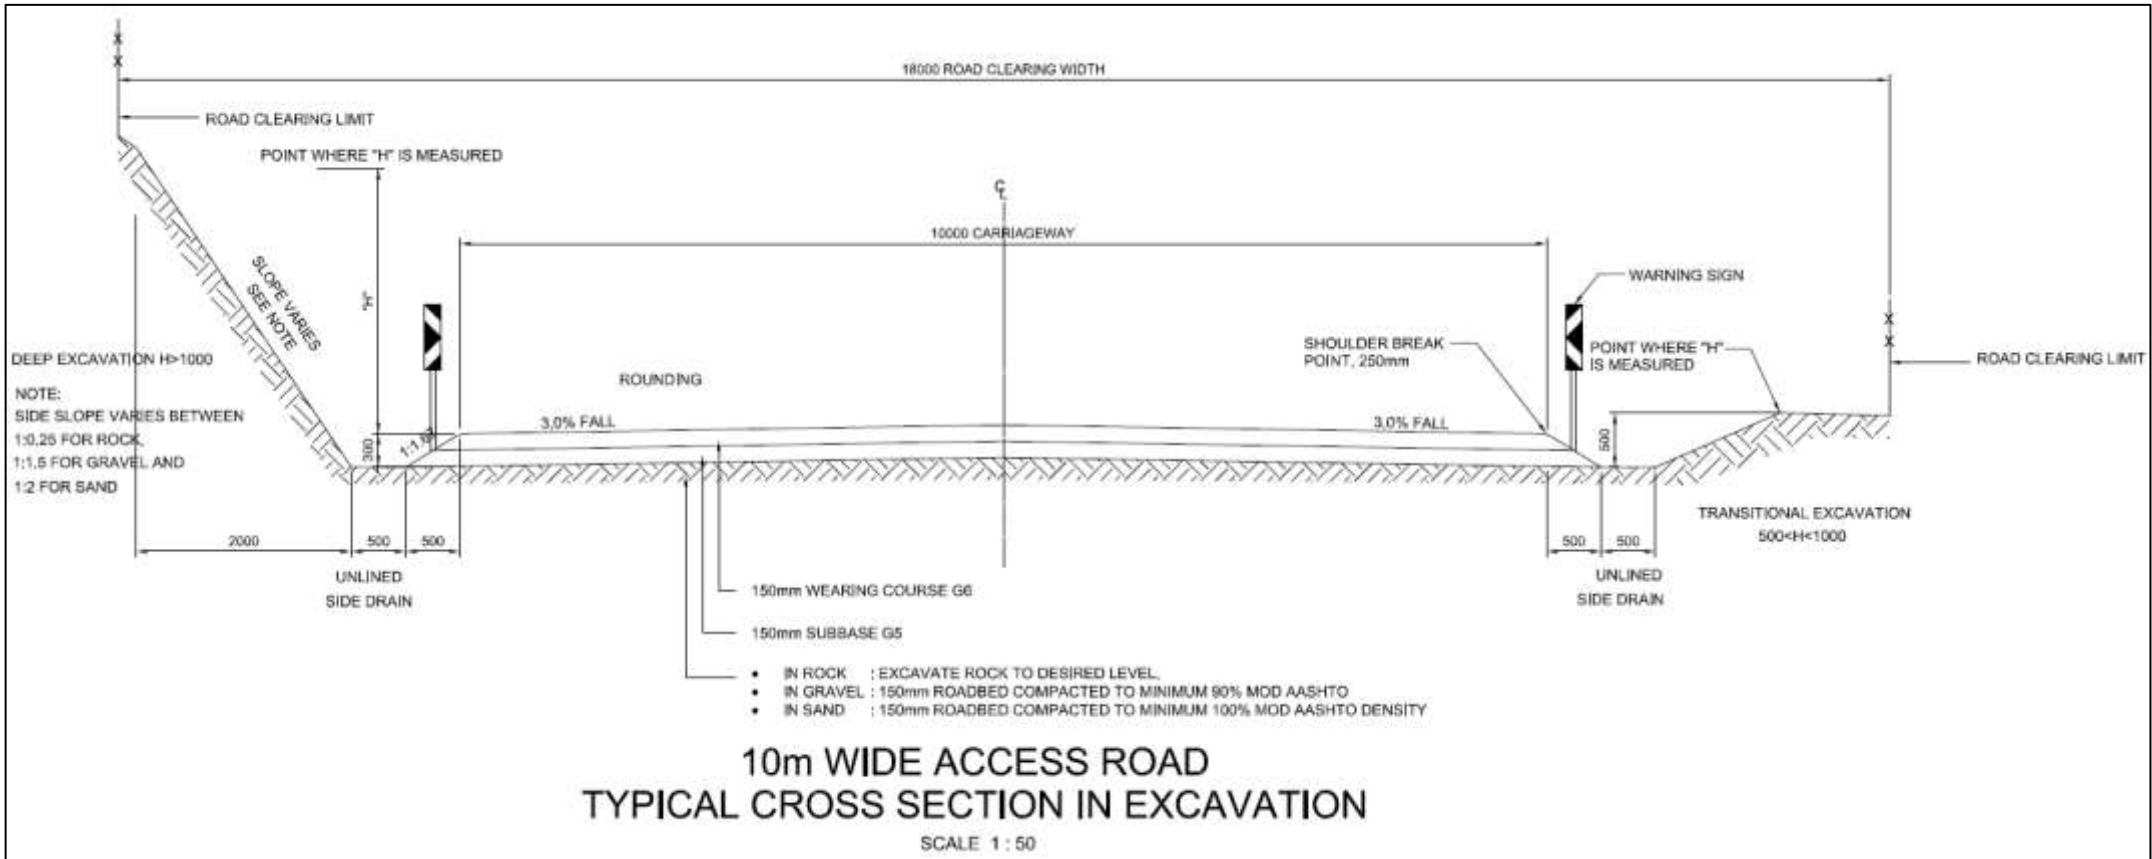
Access Road design excavation drilling site engineering example (Source: Preliminary Drawings by Burmeister & Partners for REN, 2022).
